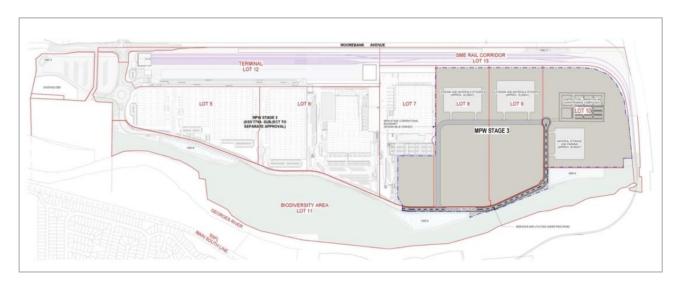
MPW3 Site Layout (MPW S2 S3 CEMP, Rev R, 2022)
